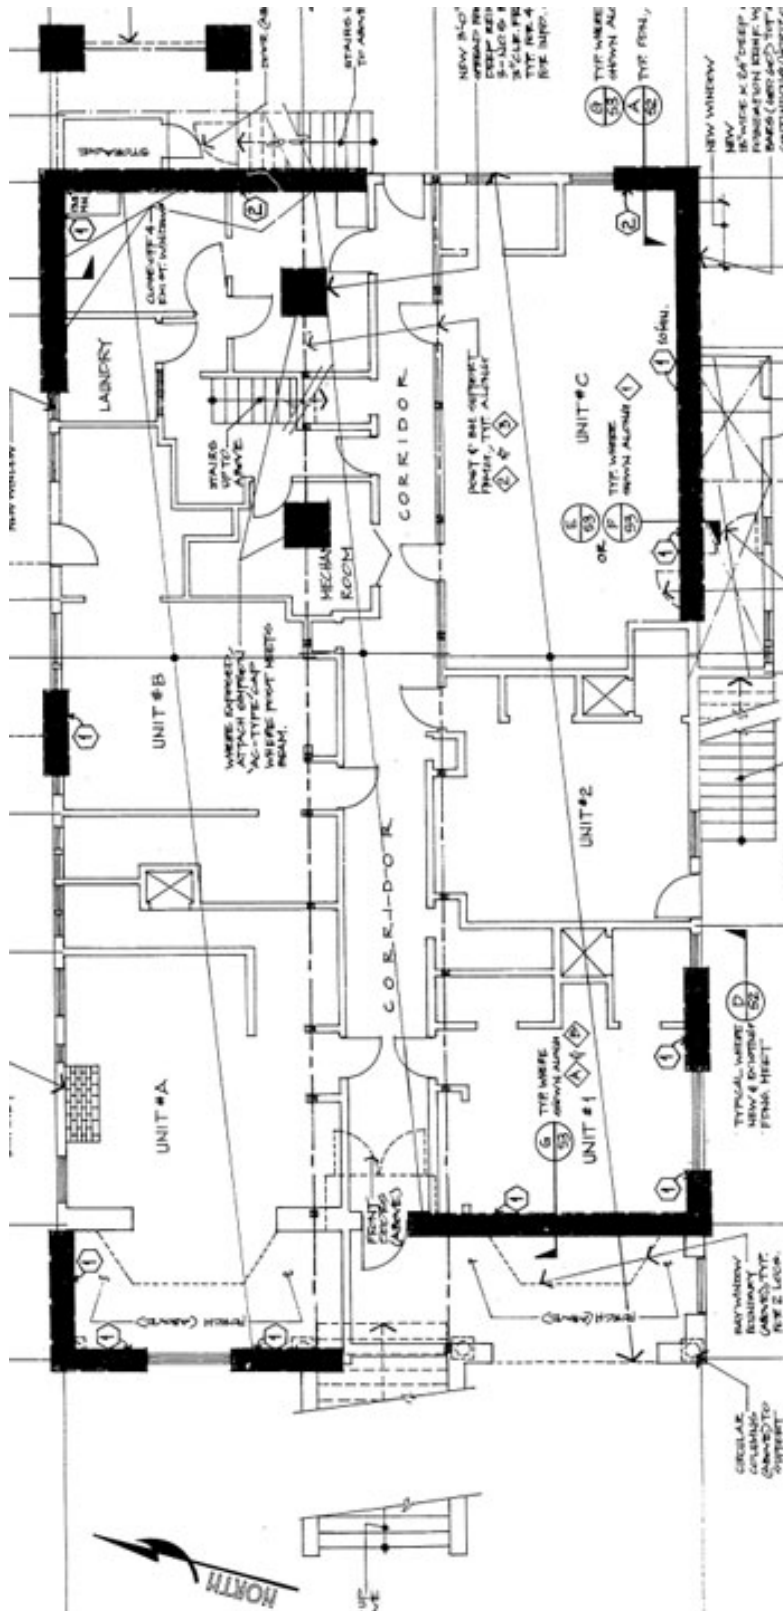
Slater House foundation plan, 2000 (City of Berkeley Planning Department)
